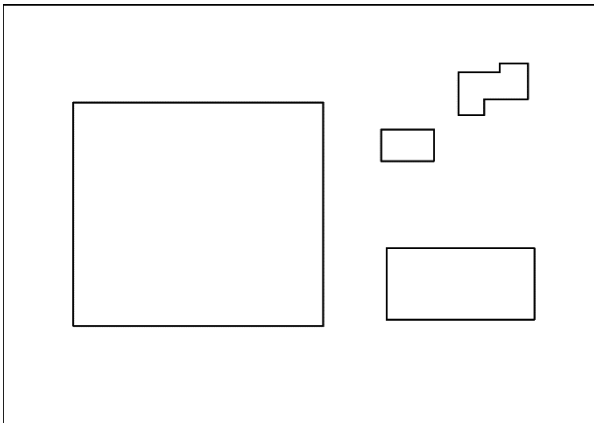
Example of a floor plan of a Brazilian Youth Prison - Form F
